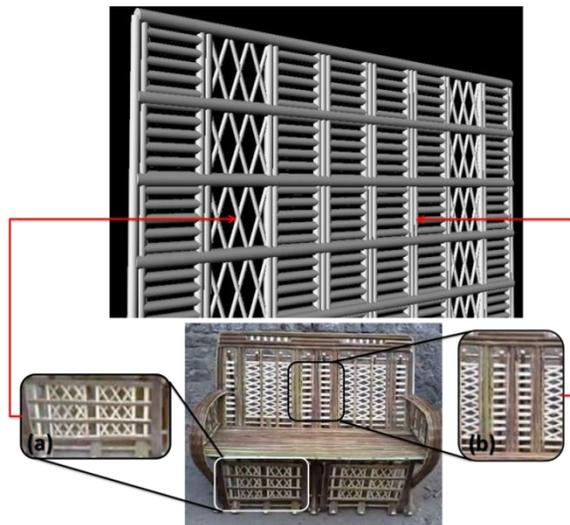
The details of the prefabricated date palm midribs enclosure wall panel as inspired by a traditional date palm chair. (a) A diagonal bracing in the footing panel (b) The secondary horizontal midribs and the main vertical midribs in between 2 adjoining secondary vertical midribs.
